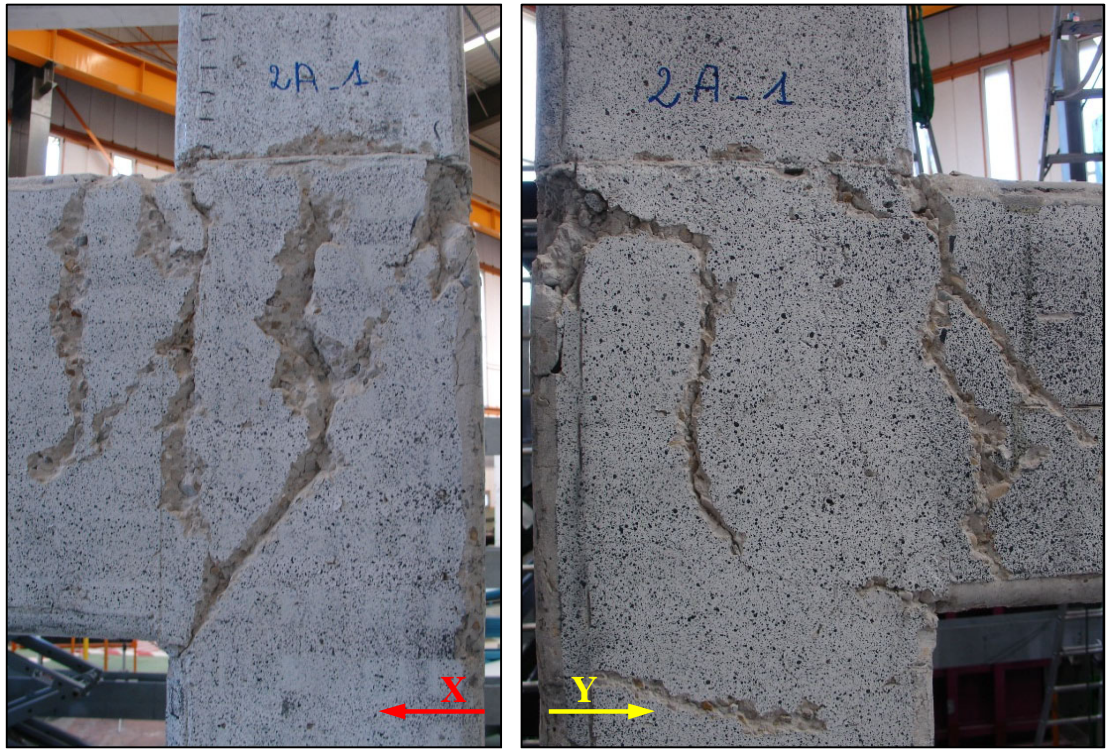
Damage of joint J2A-1<sup>st</sup> at 0.15g – second series
